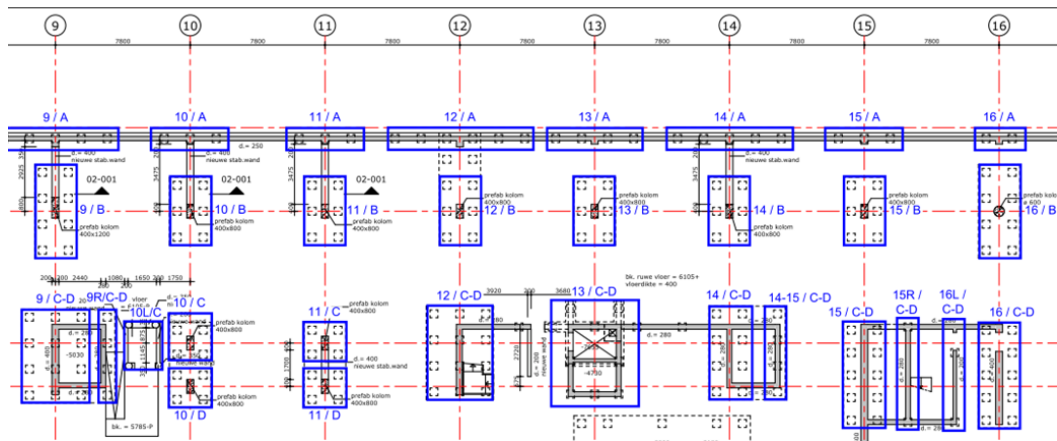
Pile plan(Source: internal Arcadis document 1)Table D.4: Pile foundation concrete benchmark(Source: internal Arcadis document 1)
